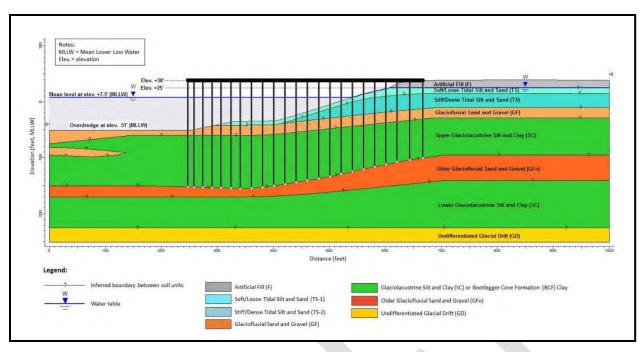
Typical Soil Cross Section at Terminal Wharf and Access Trestles
